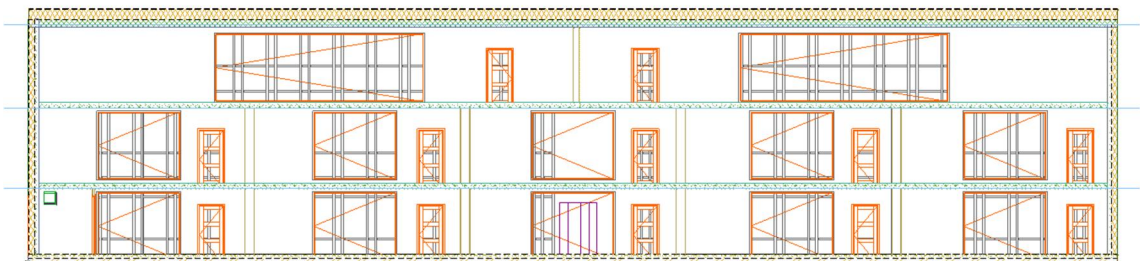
A West to East section of the 2500m<sup>2</sup> building.
